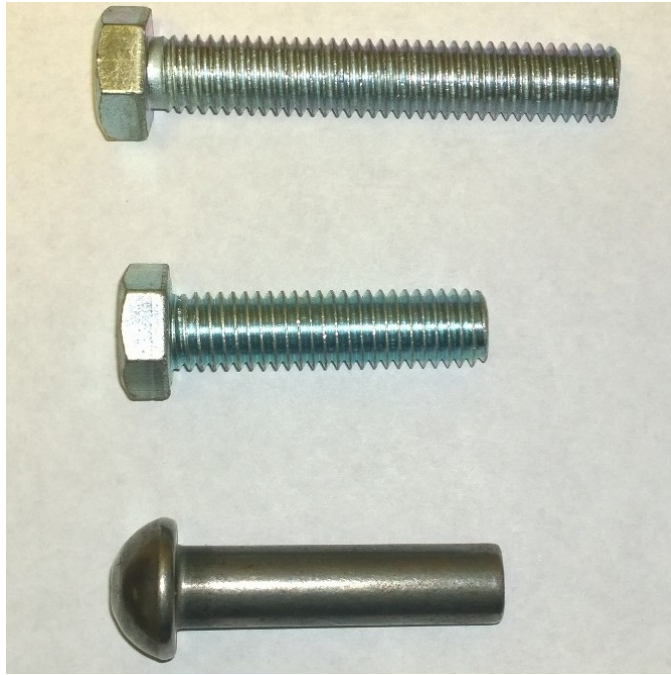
Typical Fastener Specimen; Top to Bottom: ASTM A307 Bolt for Double Shear specimens, ASTM A307 Bolt for Single Shear Specimens, and Un-Driven, Un-Heated ASTM A502 Rivet.
